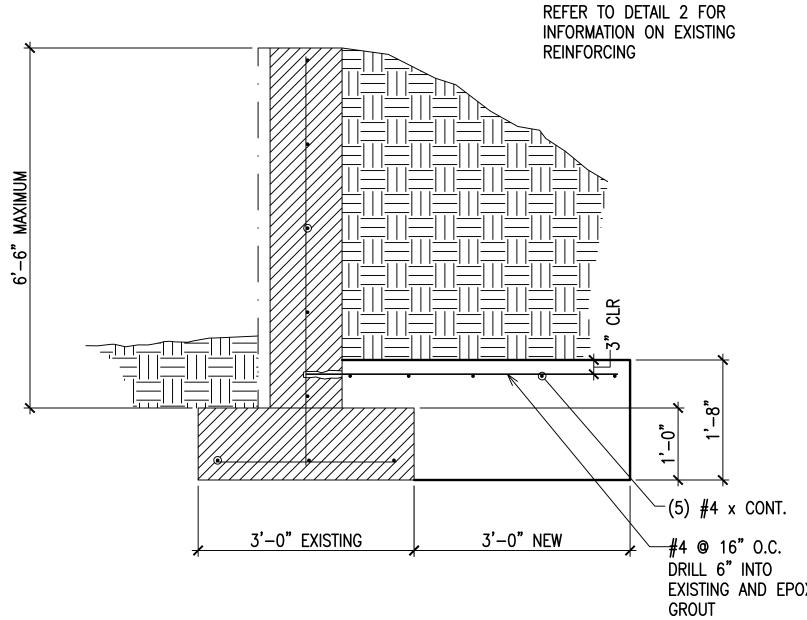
/4" = 1'-0" EXISTING PROPERTY LINE RETAINING WALL TO REMAIN
